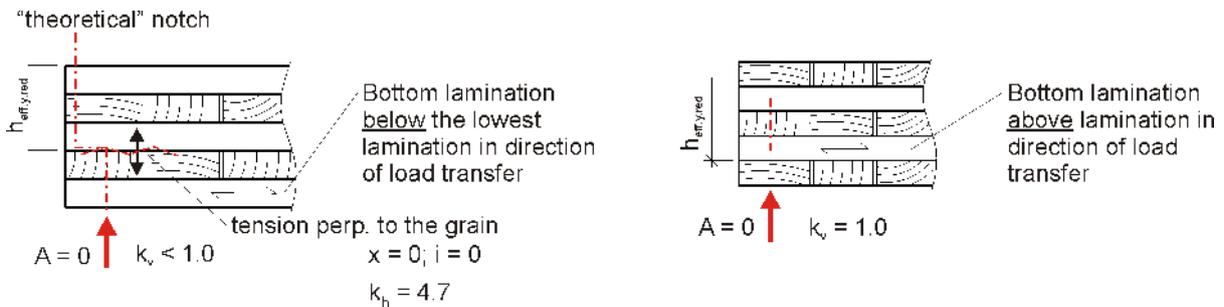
Left – partly supported edge – edge perpendicular to the cover layers
